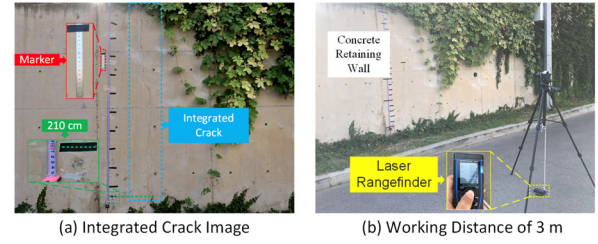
(a) The integrated crack in the concrete retaining wall; and (b) Picture of the working distance of 3 m
